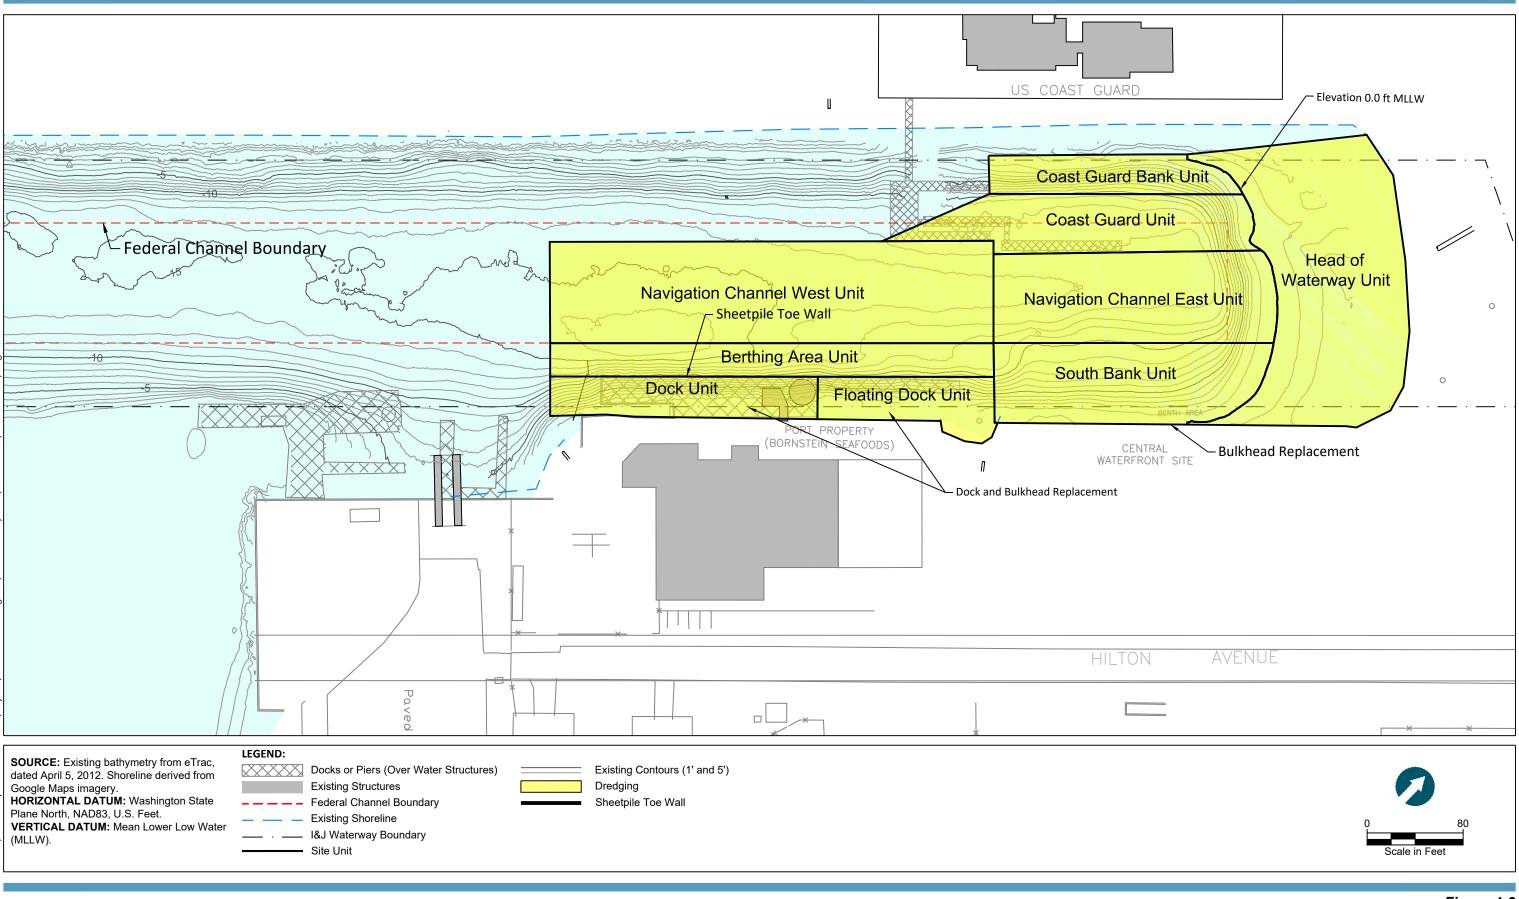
Alternative 6 Cleanup Action Plan I&J Waterway Site Port of Bellingham
